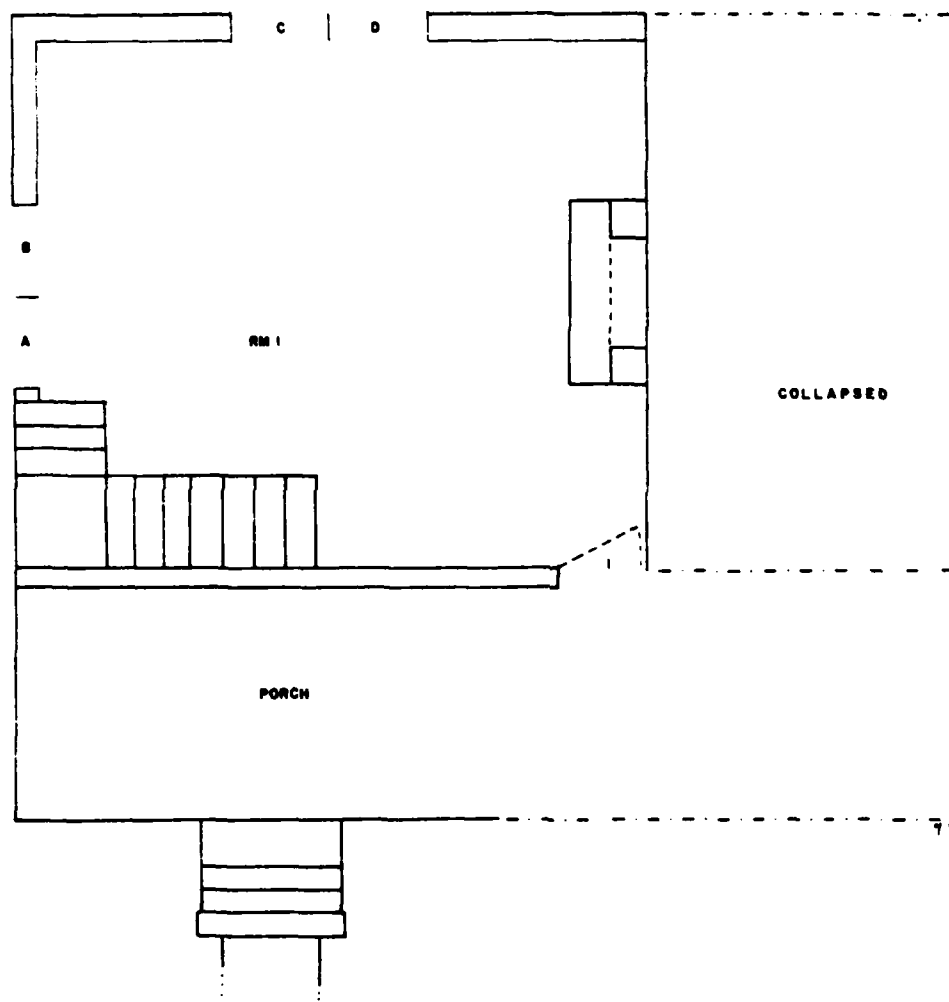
Floor plan Building 1, Room 1, Tract 411.
